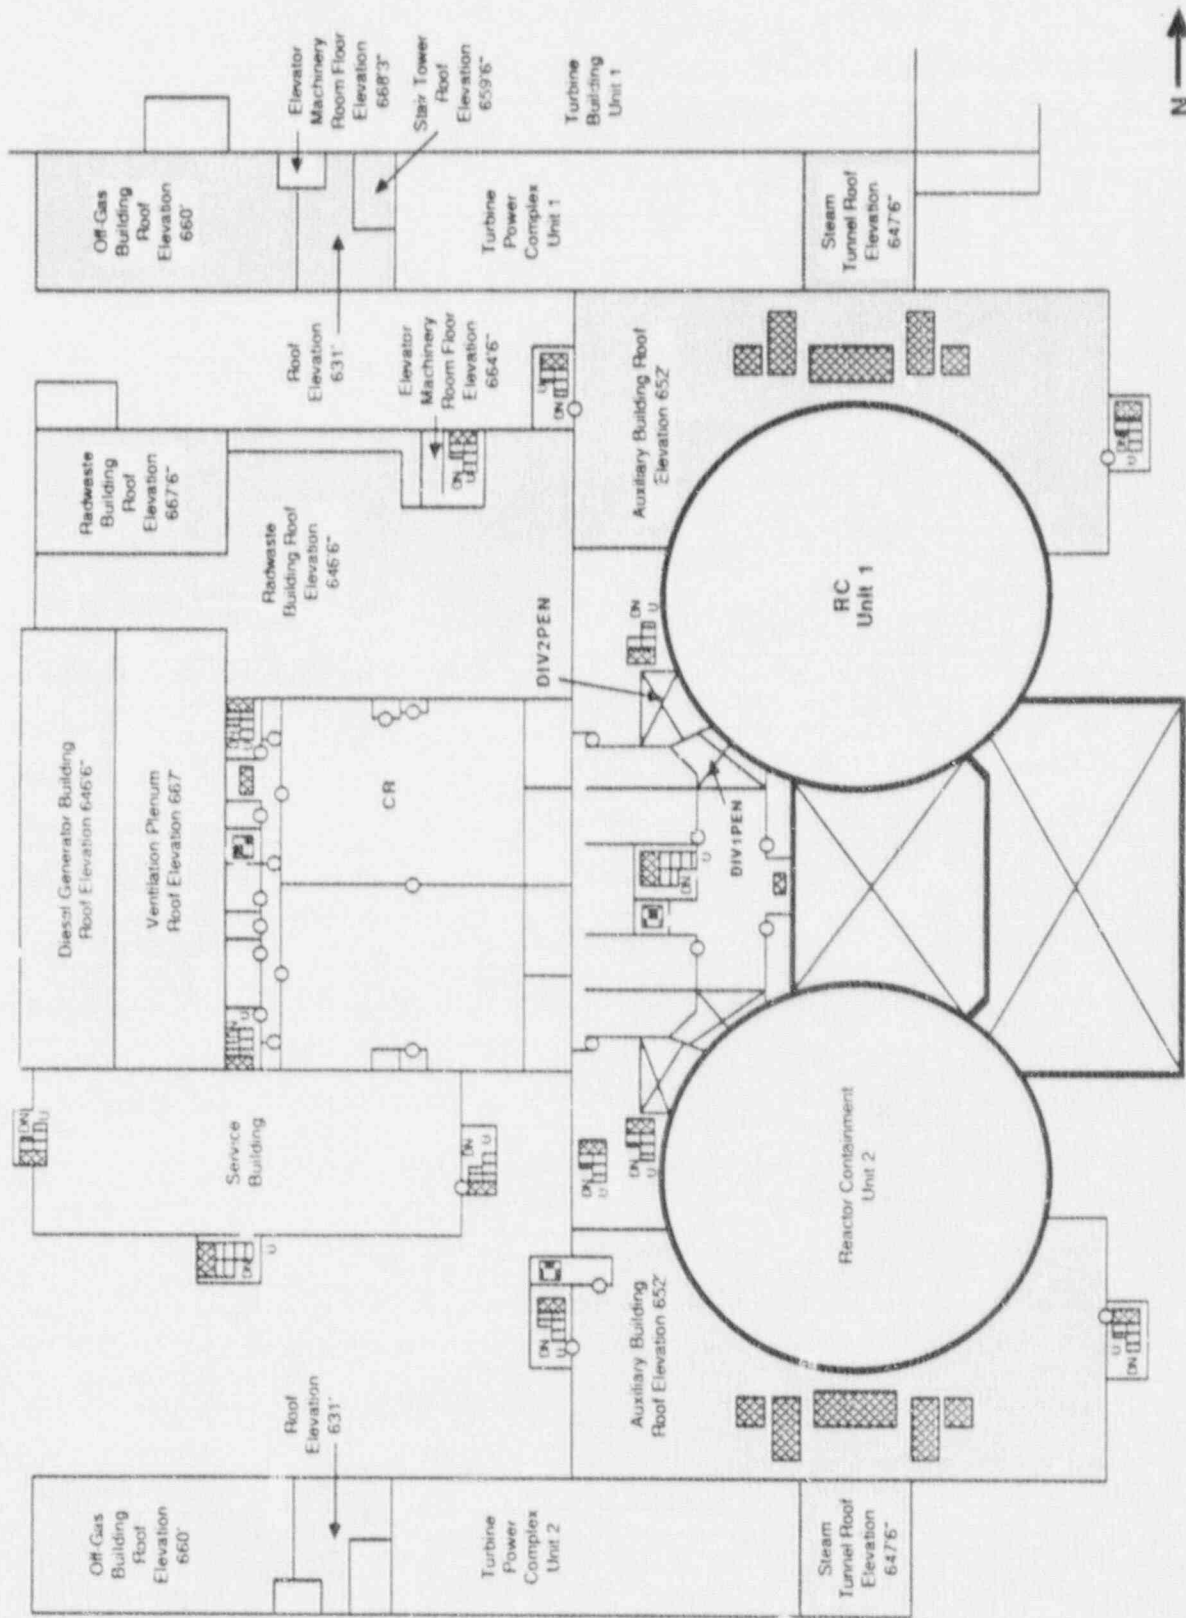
Perry 1 and 2 Reactor Building Elevation 654', Auxiliary Building Elevation 652', Intermediate Building Elevation 654', Control Complex Elevation 654', and Turbine Power Complex
